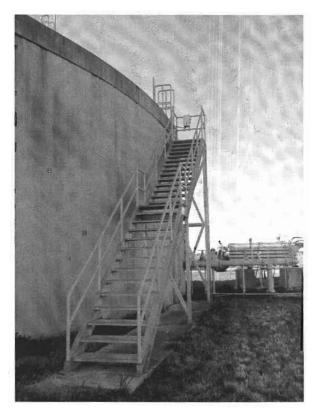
CECS inspected all three inspection platforms and stairs – no defects noted.
